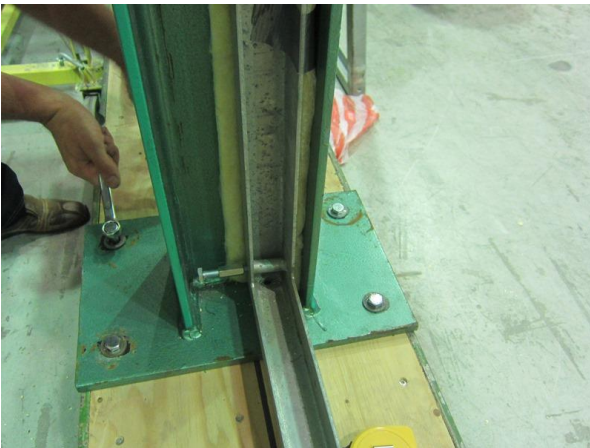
Installation of the steel post in middle width of specimen. In middle post mineral wool strips were used. Planks were sealed with sealing mass only from the sending side to installing frames.
